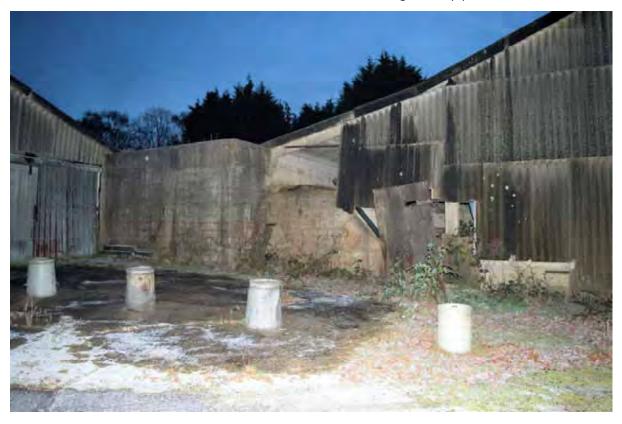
Store 10 - View of the northern end of the north-east elevation, note the encroachment of later 20^{th} century structures on all sides, facing south (562)
